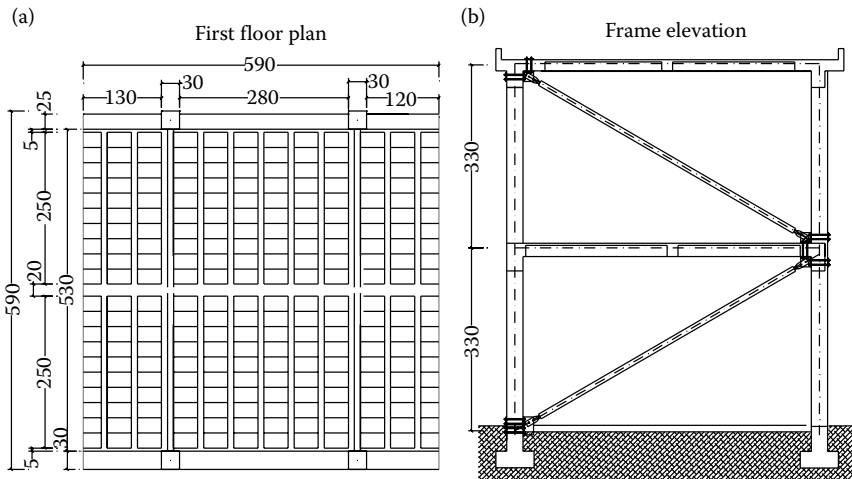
Features of the tested RC structure: (a) plane; (b) elevation.
